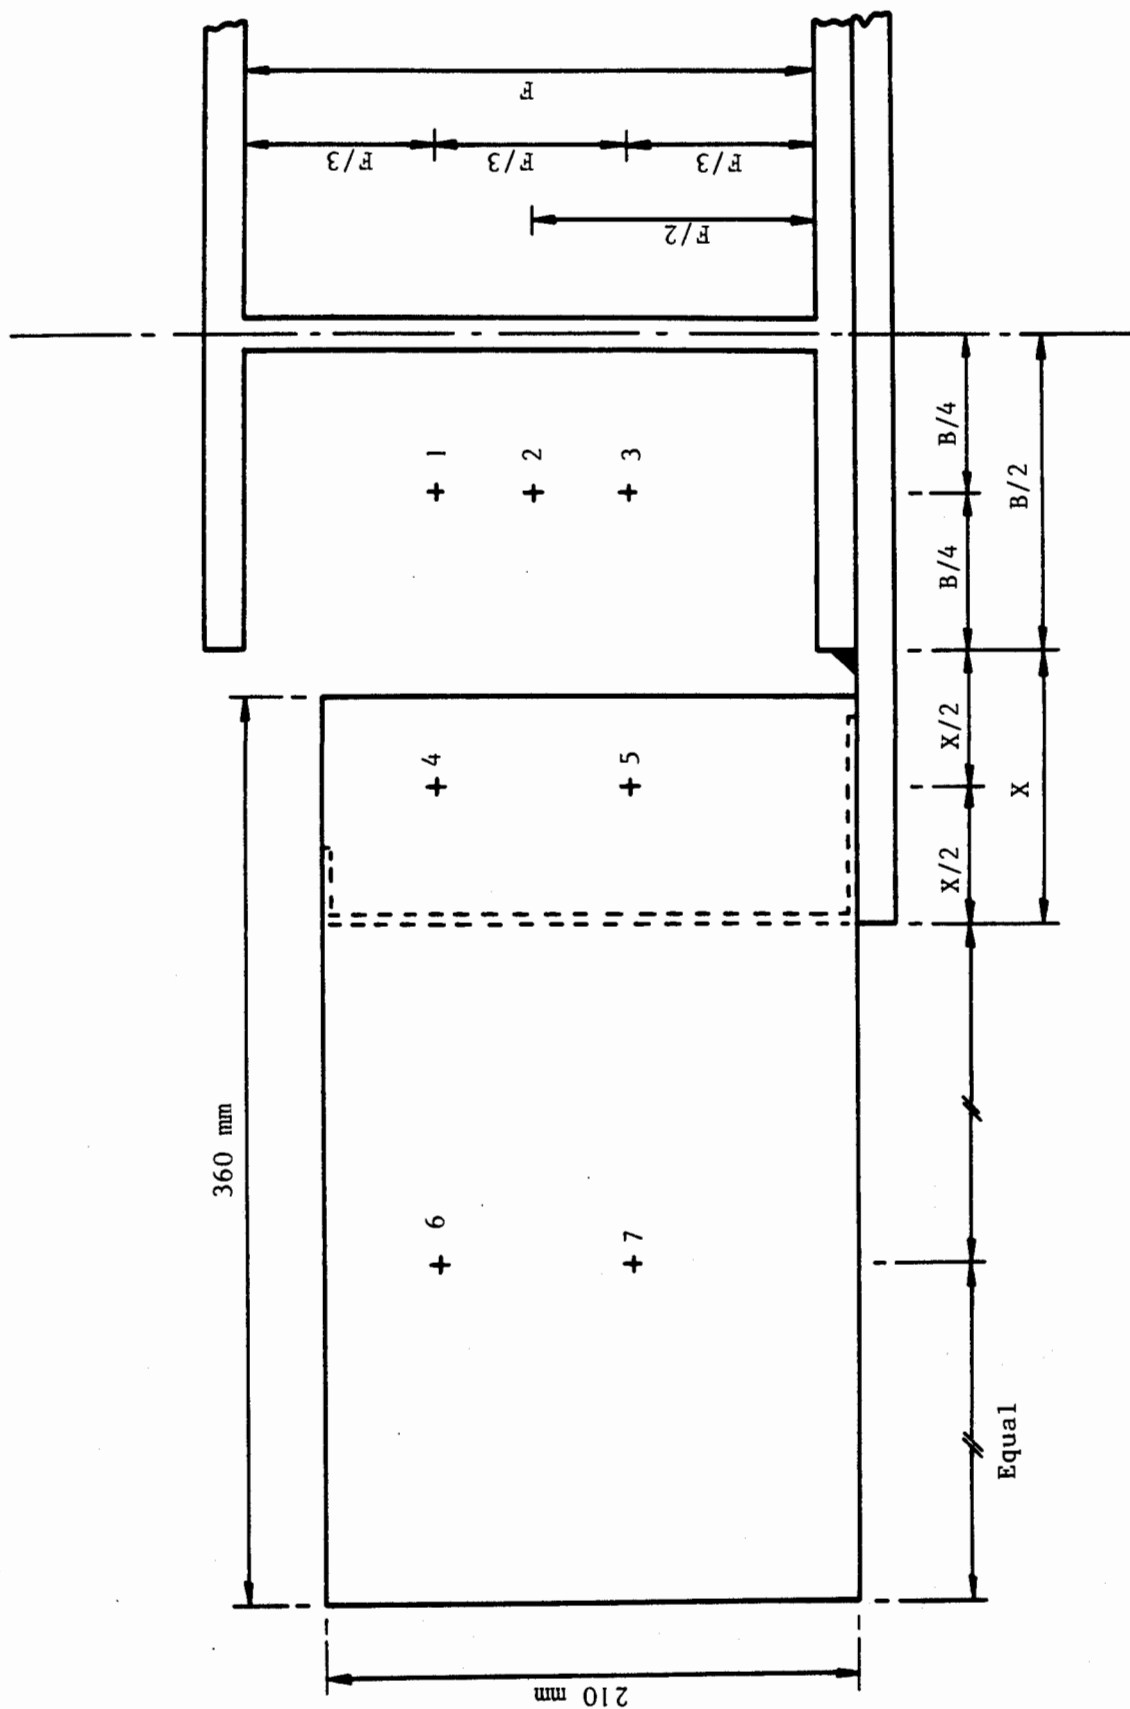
THERMOCOUPLE POSITIONS IN THE CONCRETE - TRANSVERSE ARRANGEMENT (R4/56)
